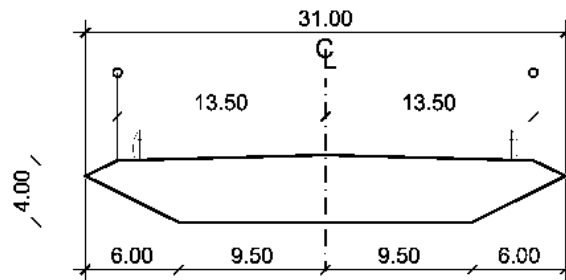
Cross section of the Great Belt East Bridge, Denmark.
